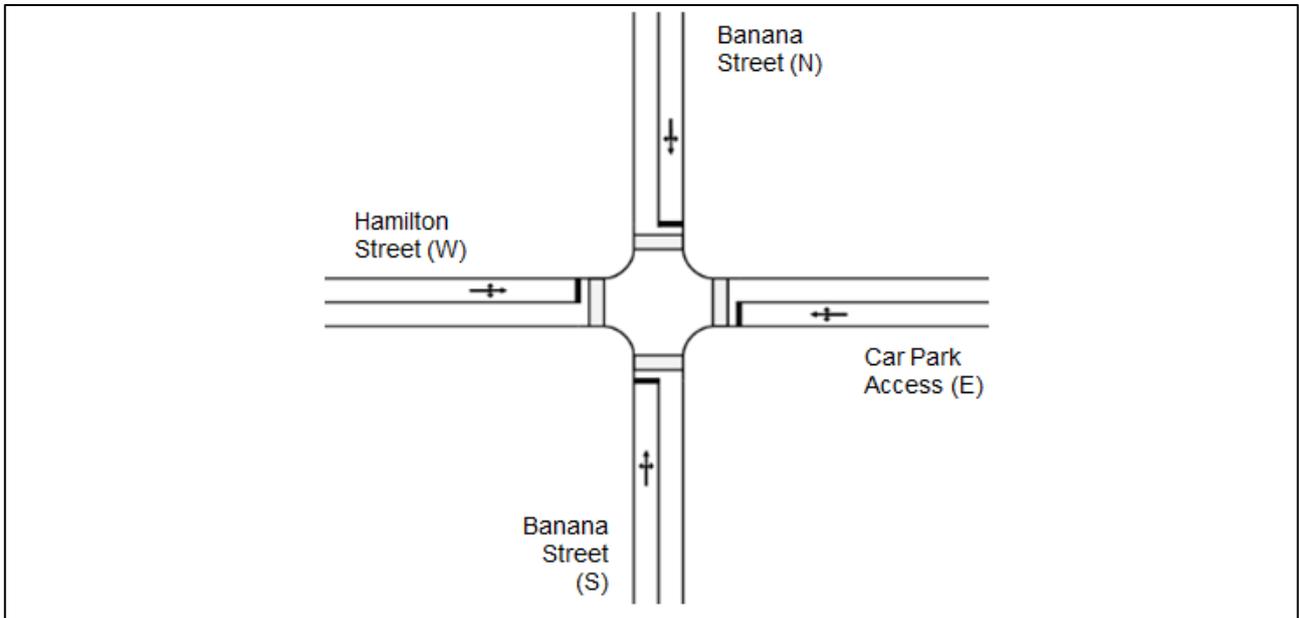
Banana Street/Car Park Access – Existing Layout
